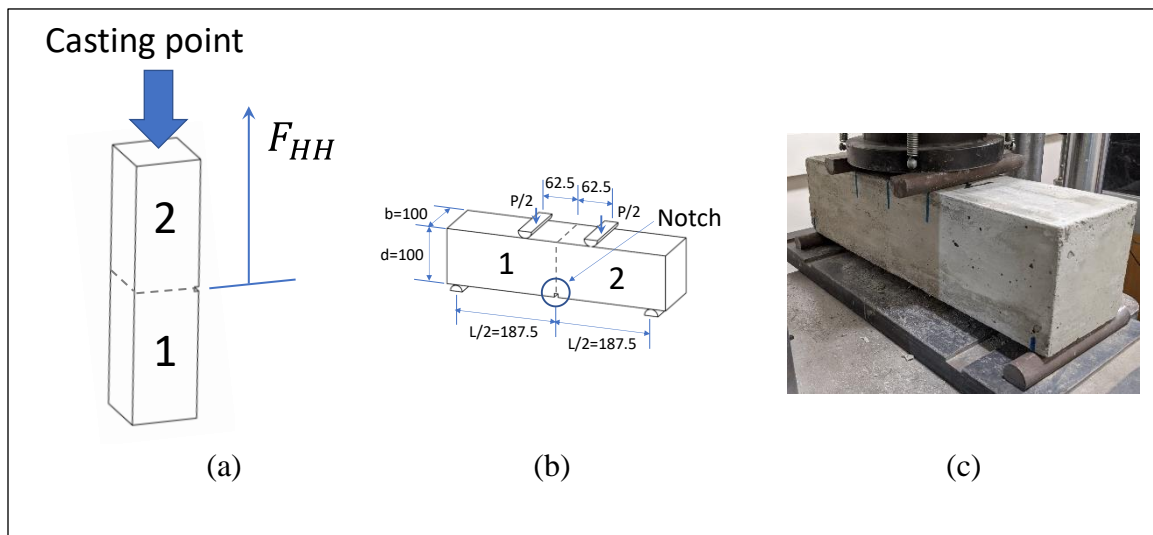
Casting (a), sample dimensions in mm (b), and testing set up (c) of the flexural strength test. Note: Numbers 1 and 2 represent the two layers used during the casting of the specimens.
